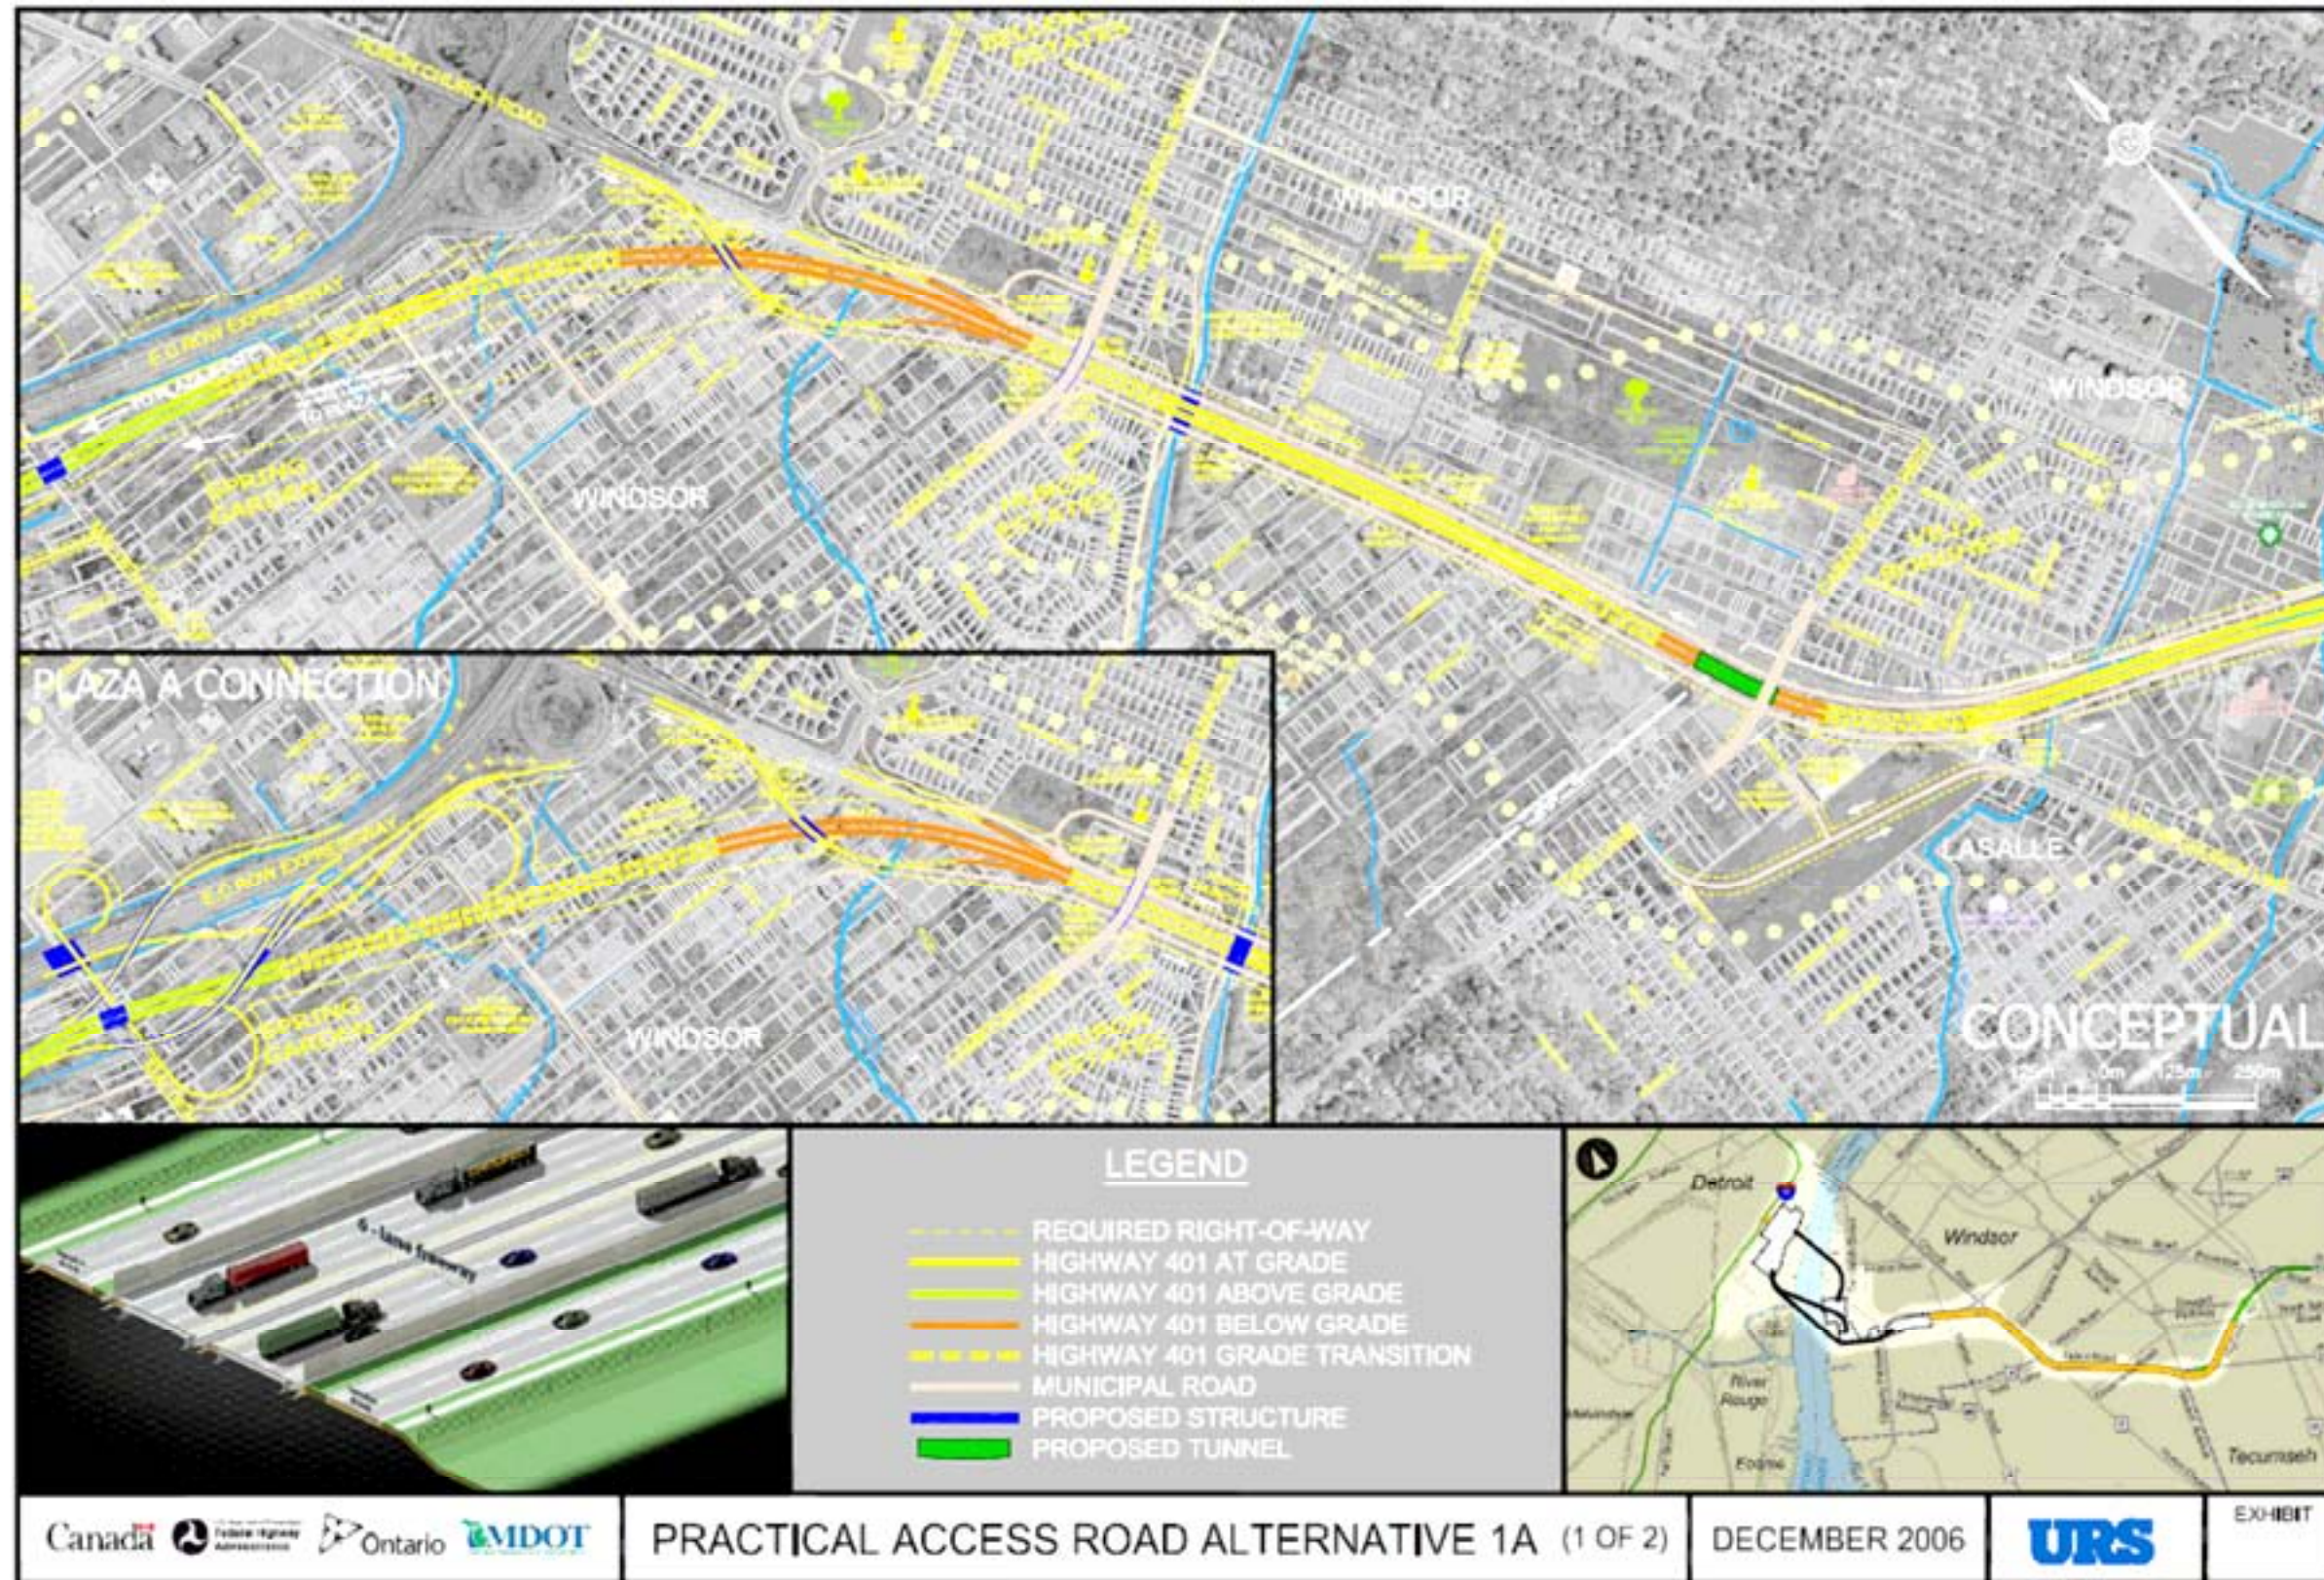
B- PRACTICAL ACCESS ROAD ALTERNATIVE 1A
